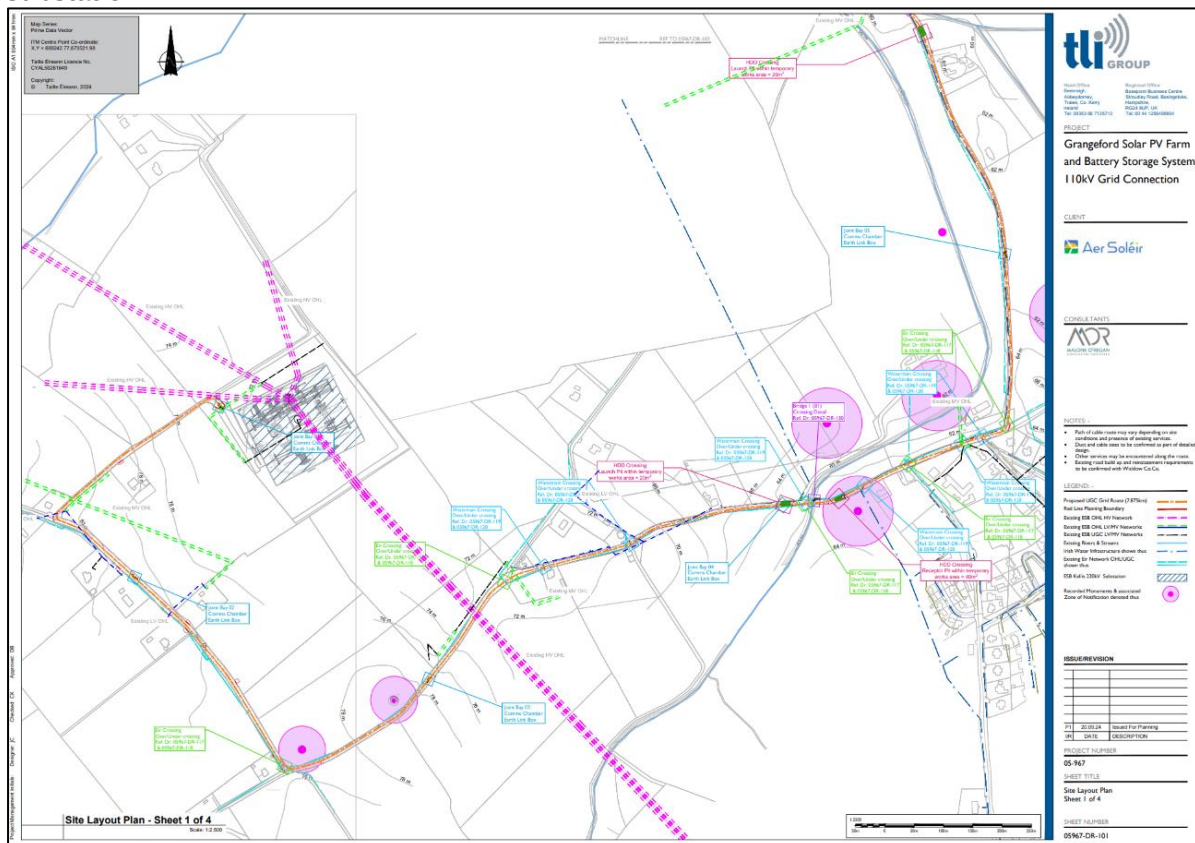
Route of underground cable, where it connects with the existing Kellistown substation
